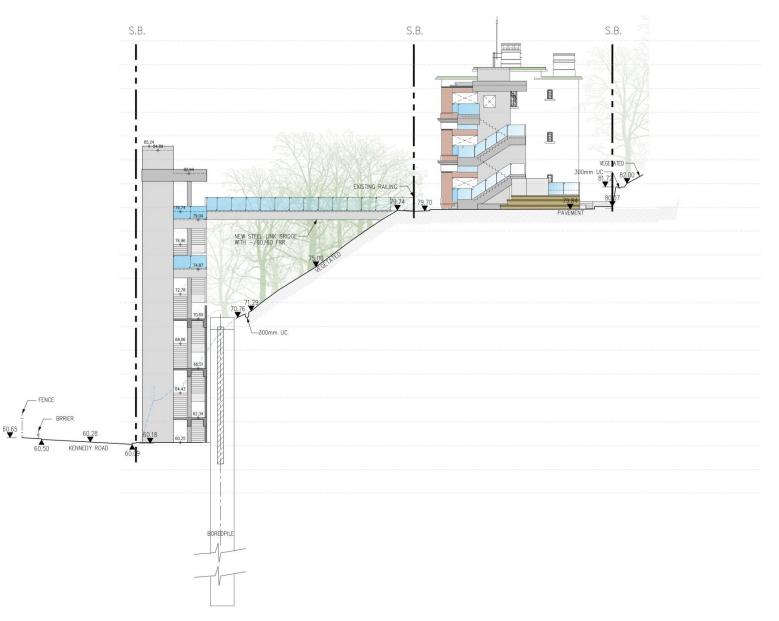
Proposed section AA', the Site and Ancillary Site (not to scale)
